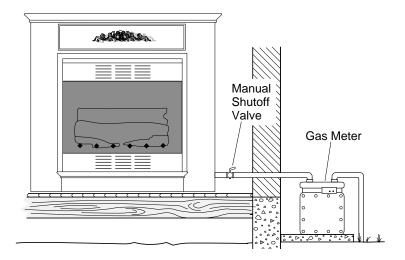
Checking Gas Joints (Shown With Optional Mantel)
